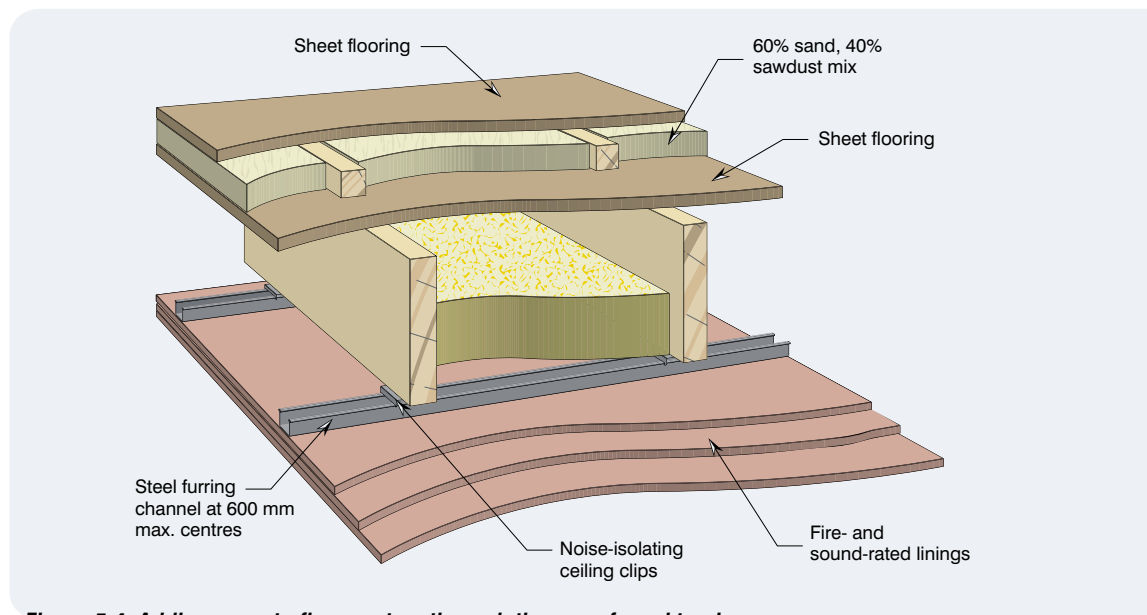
Adding mass to floor system through the use of sand top layer.
